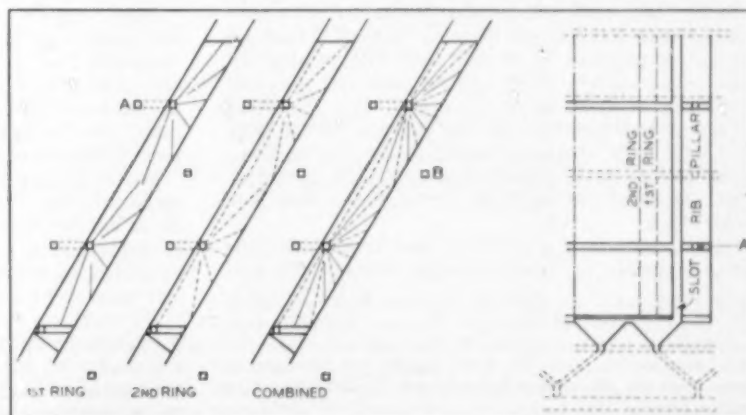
At left, split ring stoping cross-section shows method of drilling from hanging wall drives. A indicates hanging wall crosscut for caving. B indicates pillar recovery drive. At right, first and second rings of longitudinal stoping. A indicates hanging wall crosscut.
